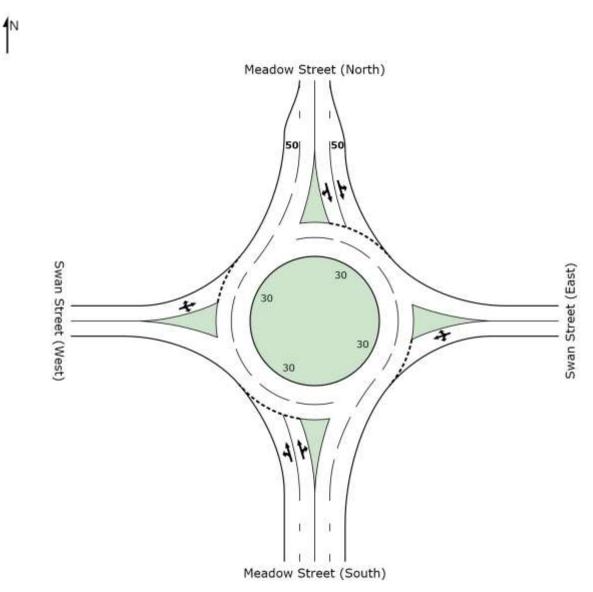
Existing Geometry of Intersection of Meadow Street and Swan Street
